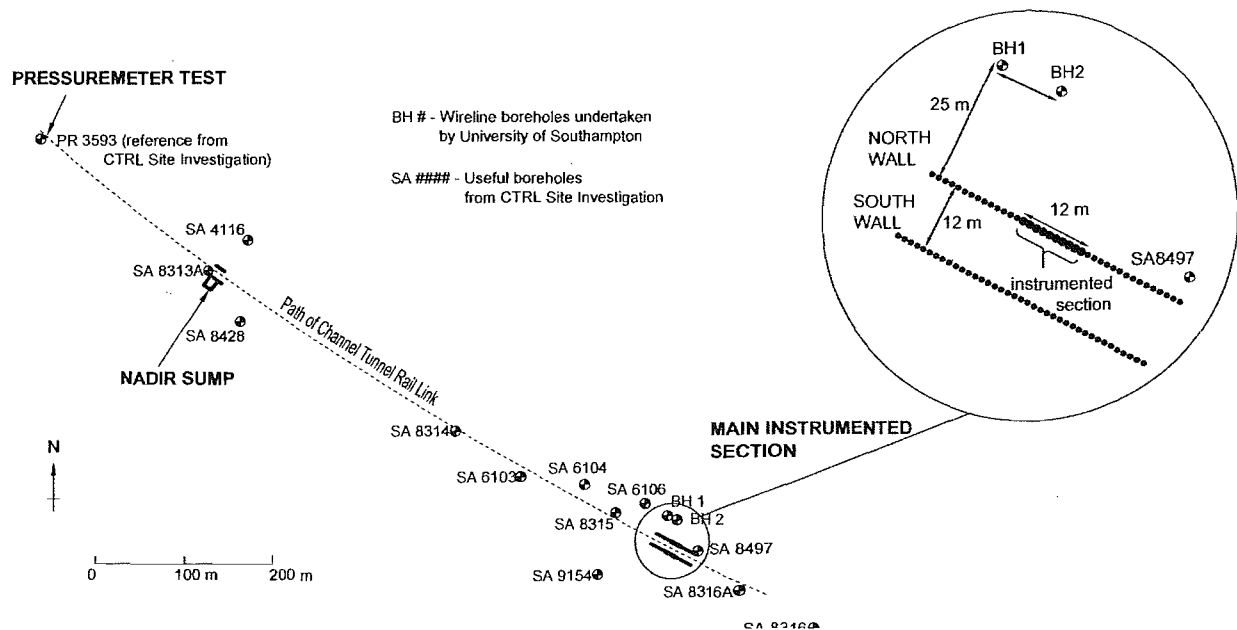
Site location and plan of instrumentation (Clark, 2006).
